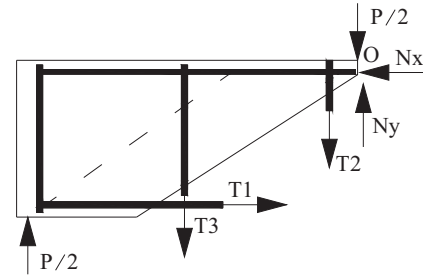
Typical cross-section loss of tension bars in deep beams.
